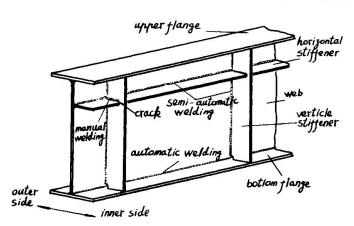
Cracks in the welds connecting horizontal and vertical stiffeners
